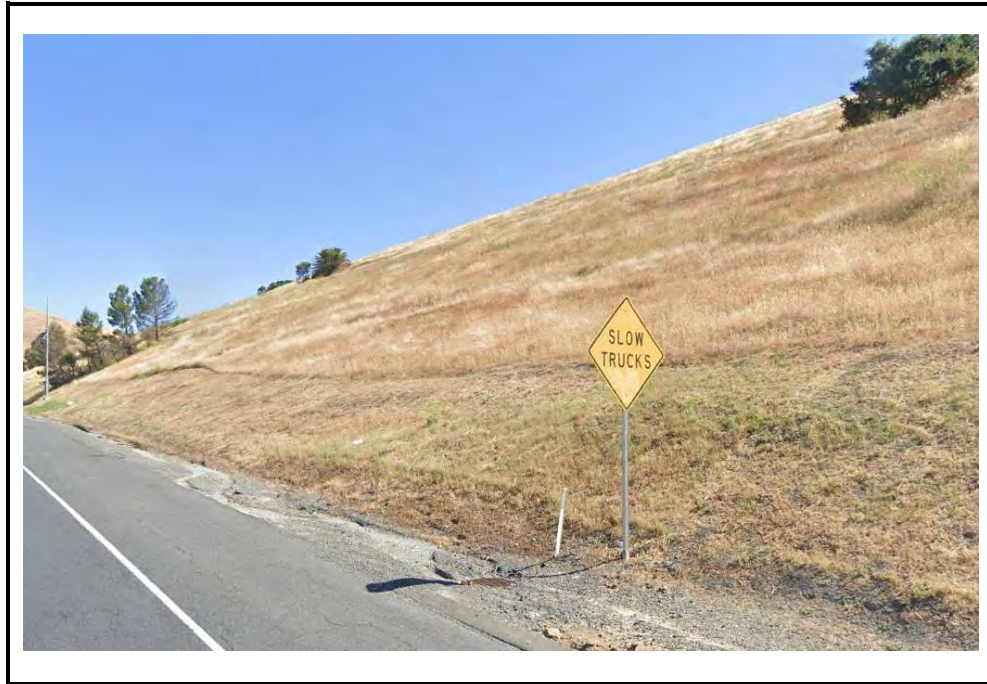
PHOTO C: CUT SLOPE, STRIP AND TRASH CAPTURE LOCATION – (NORTHEAST)
